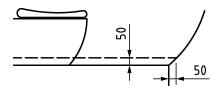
Example of an acceptable measuring point between walls and floor in a toilet
